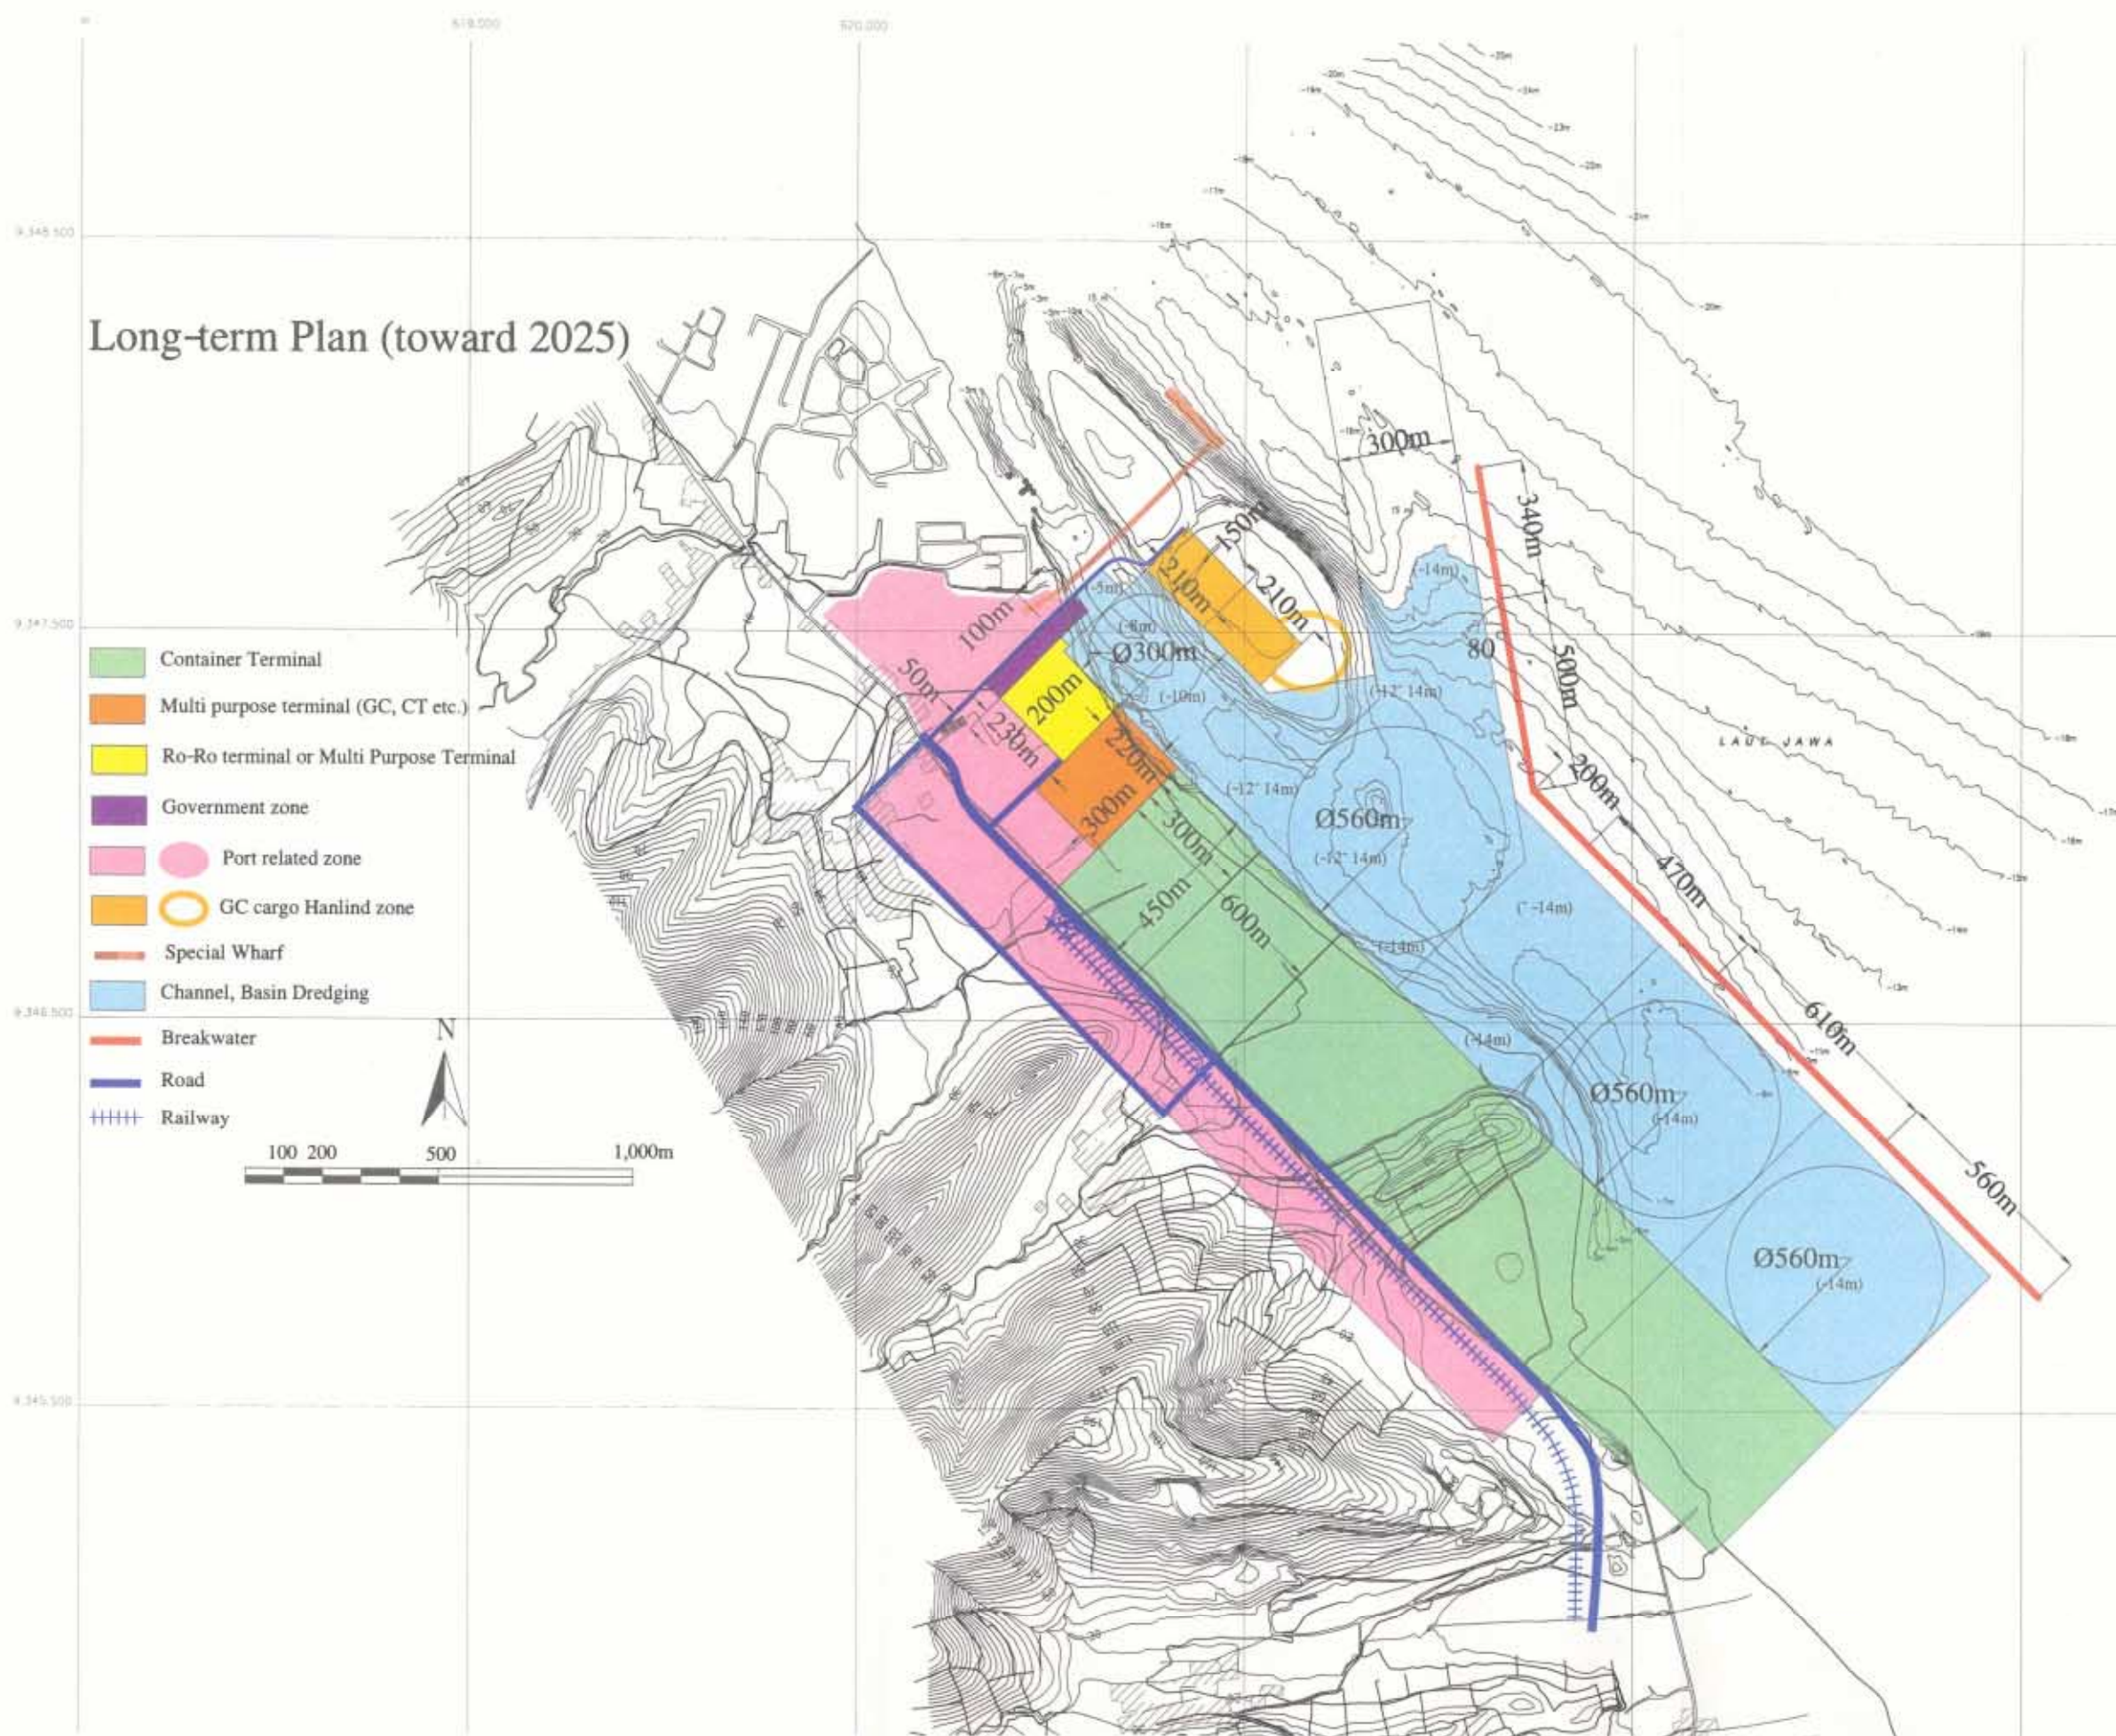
D-5 Layout Plan of Bojongegara for 2025
